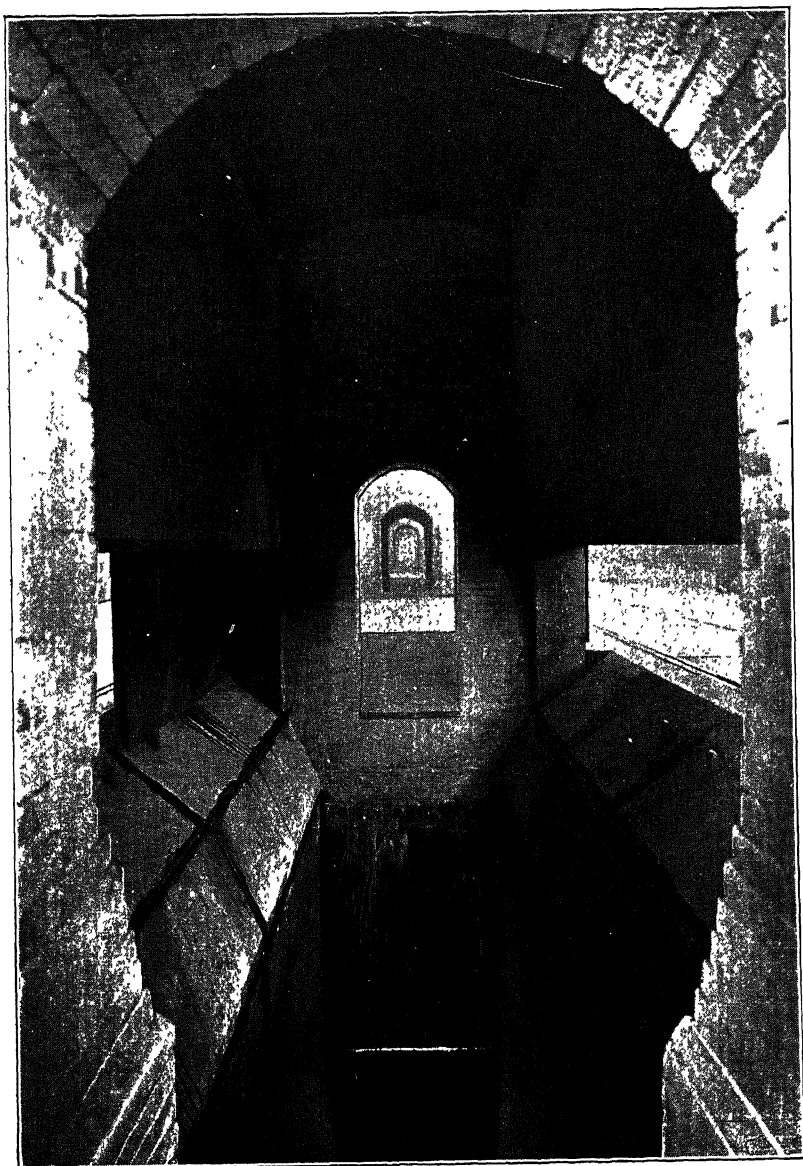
INTERIOR OF BLAST-FURNACE AT FEED-FLOOR LEVEL.
